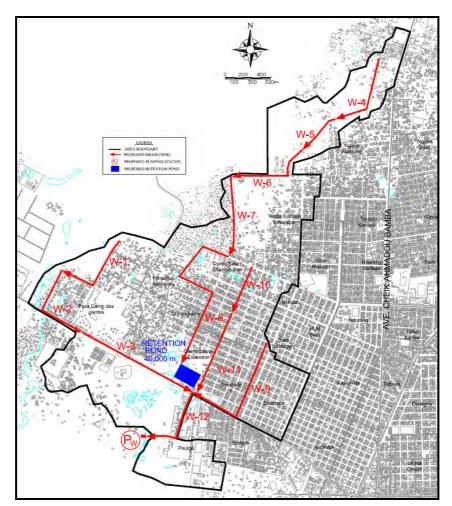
Location of Proposed Drainage Facilities in the West Drainage Area
